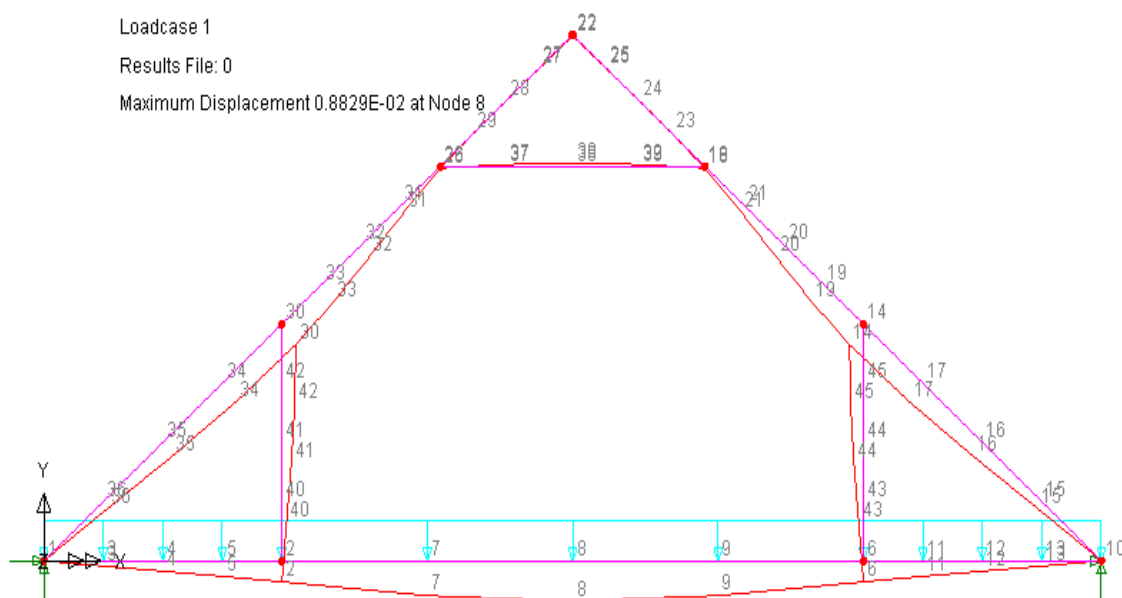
Deflection shape of an 8 m span open roof truss under imposed and dead load applied to the floor
